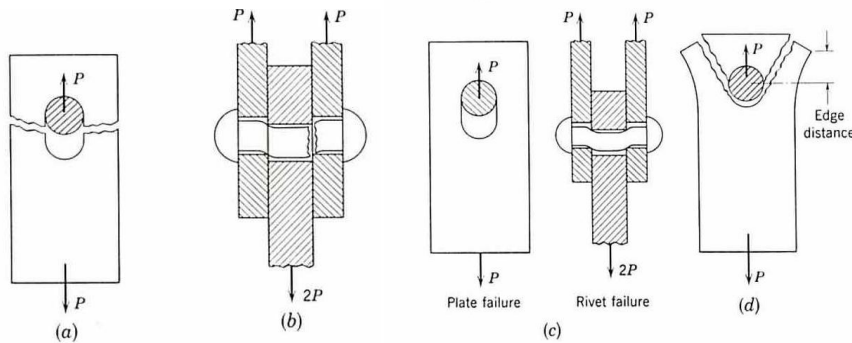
Types of riveted connection failure: a) Tension failure in the plates b) Shearing failure in the rivet, c) Bearing failure, d) Shear-out failure in the plates (Bresler et al., 1960).
